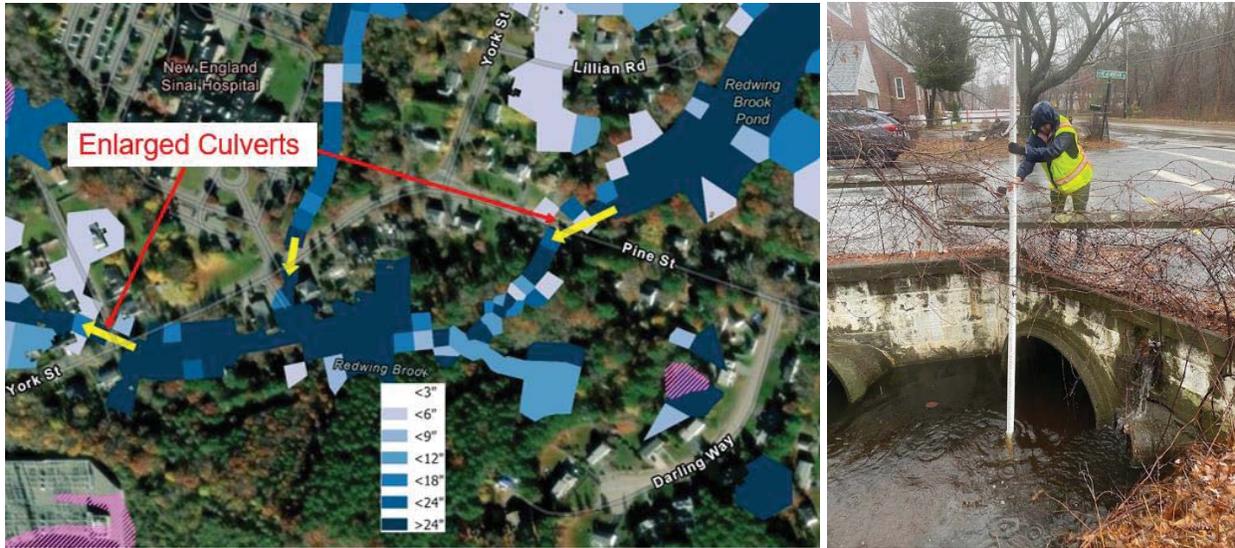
Location of enlarged culverts (L) and culvert under Meadowbrook Lane (R)
